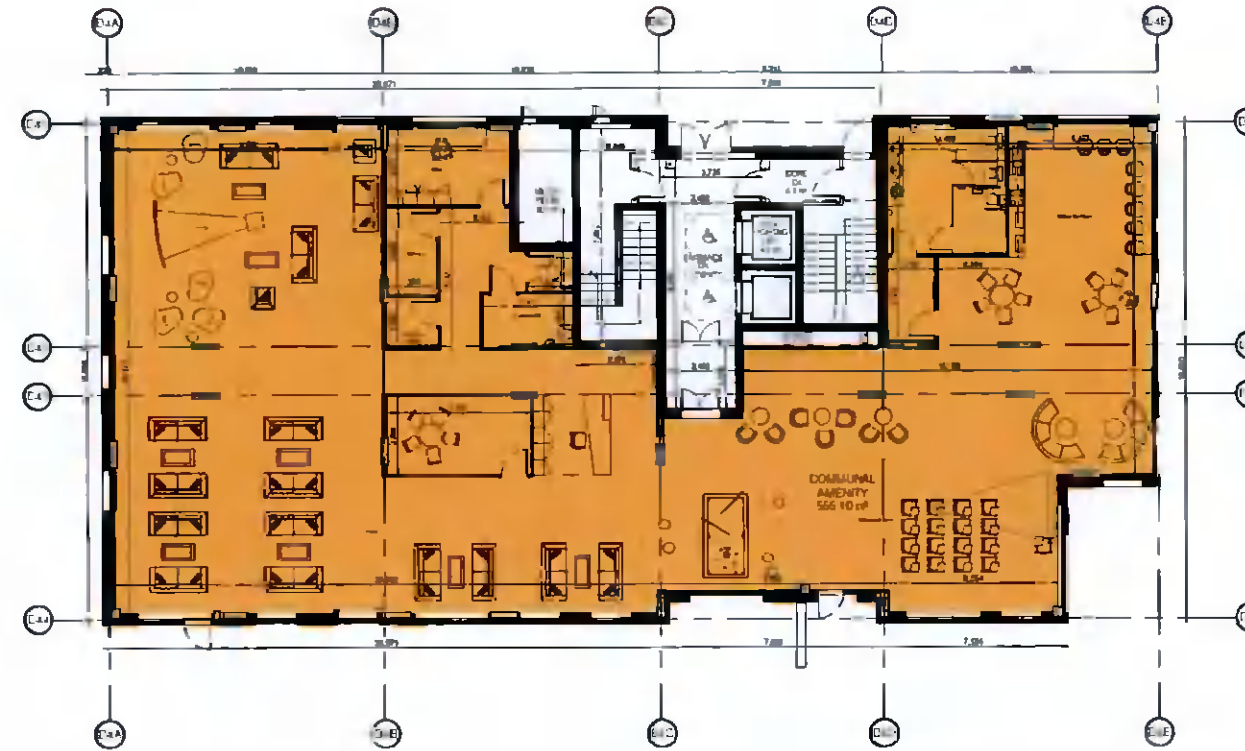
Permitted Ground Floor Plan showing Residential Amenity
